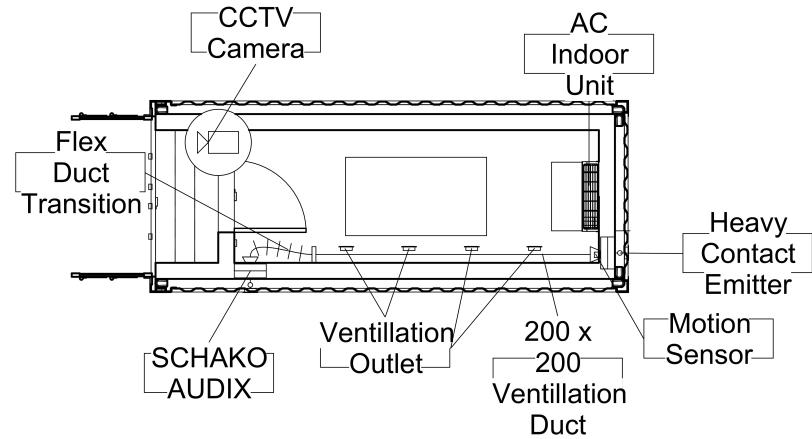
SCIF Floor Plan Showing Ventillation Duct and AC Unit
